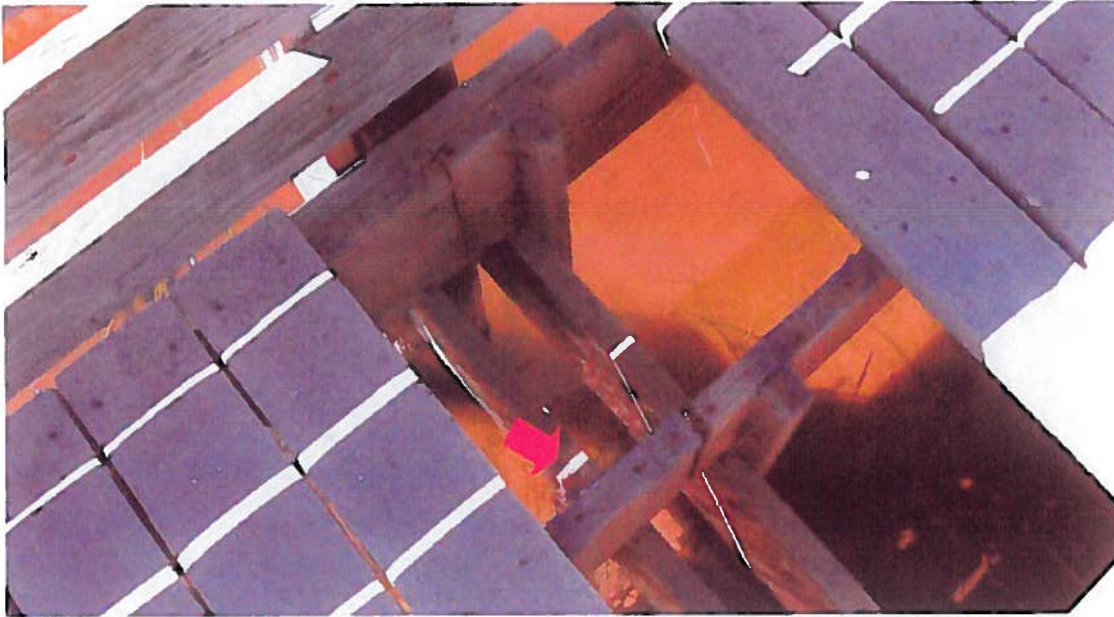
Under-deck framing showing lumber ties missing and loss of lumber tie nails due to corrosion.
